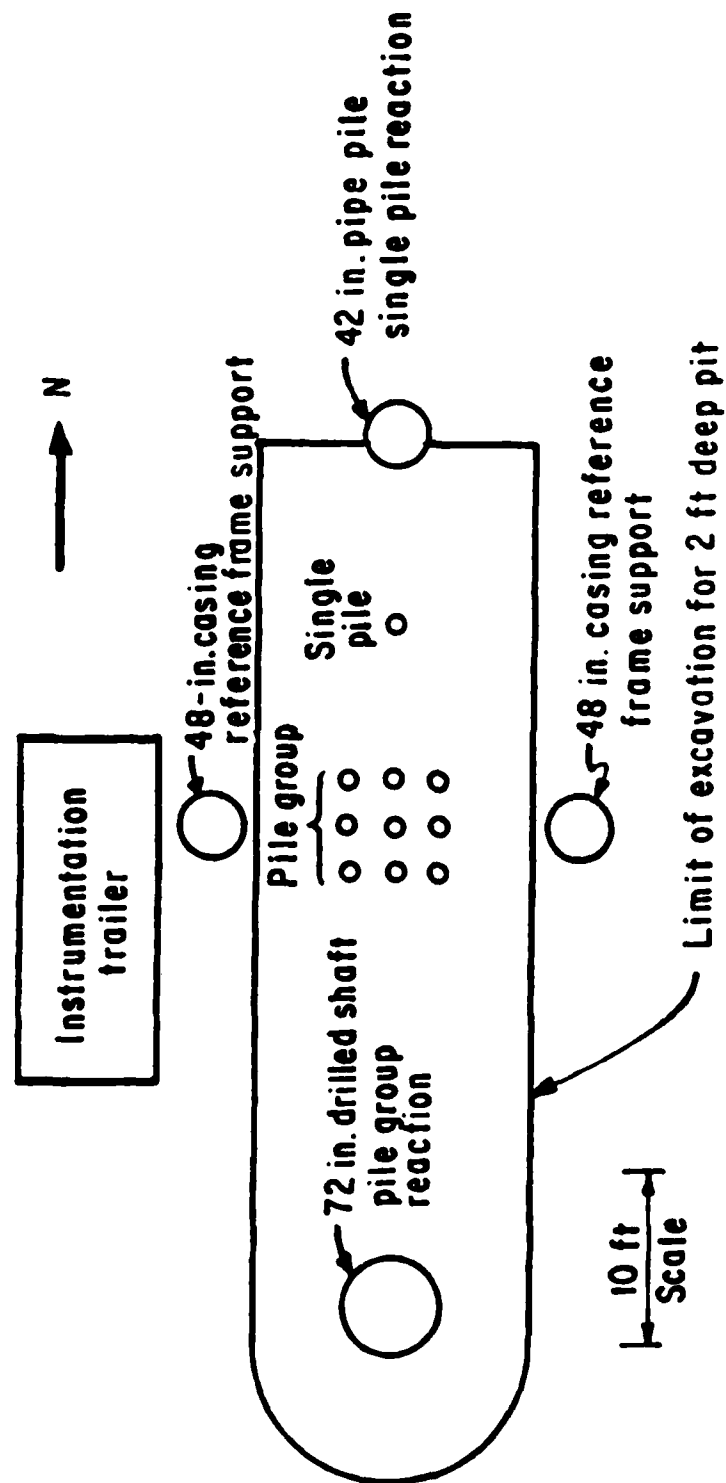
Site plan (after Brown and Reese, 1985).
